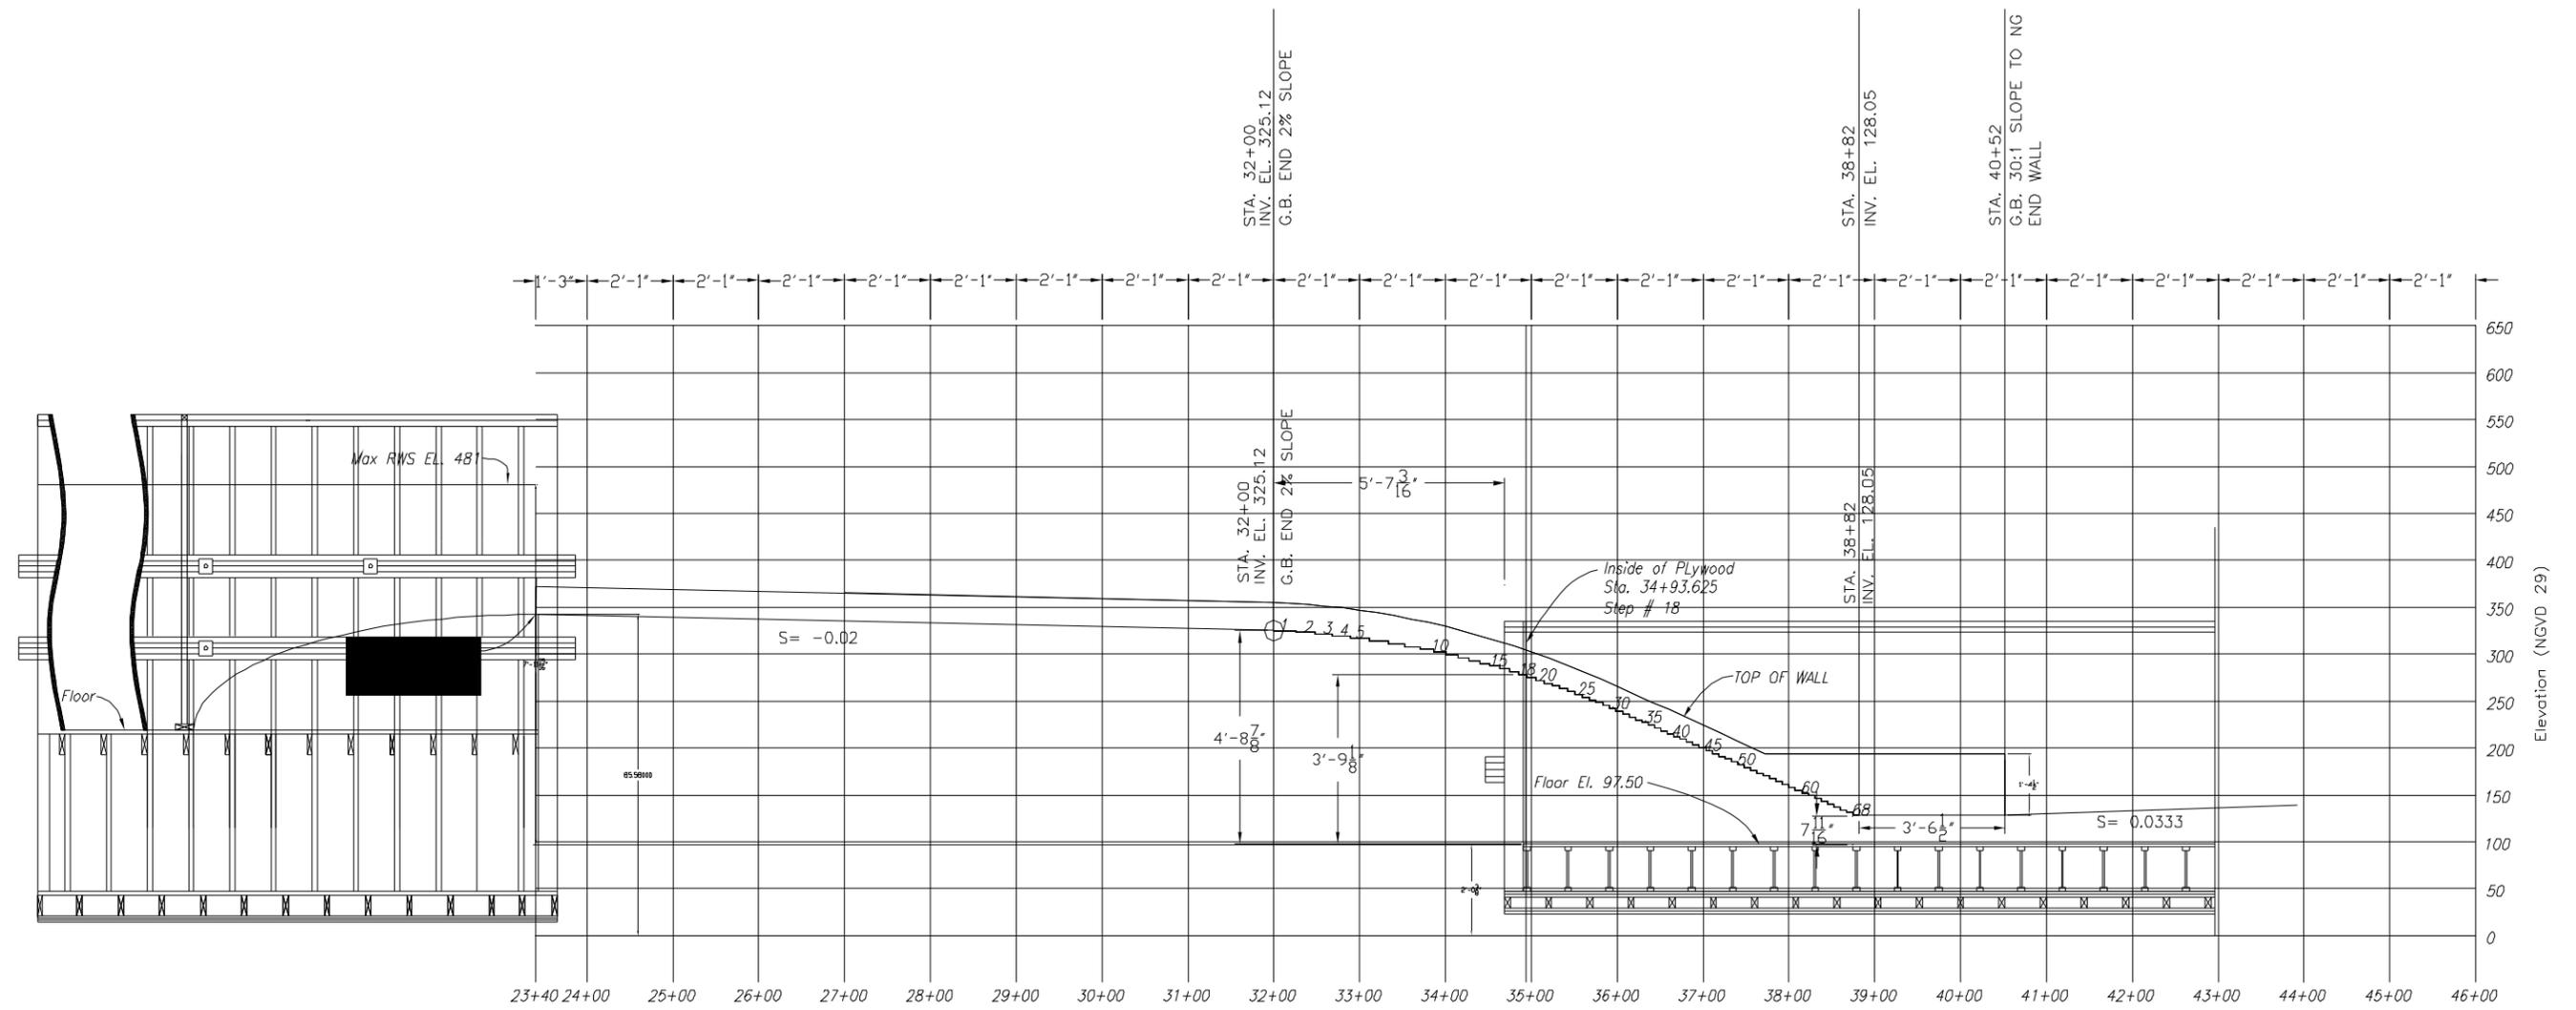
Model construction drawing: Cross-sectional profile view of auxiliary headbox, spillway chute, and stilling basin.
